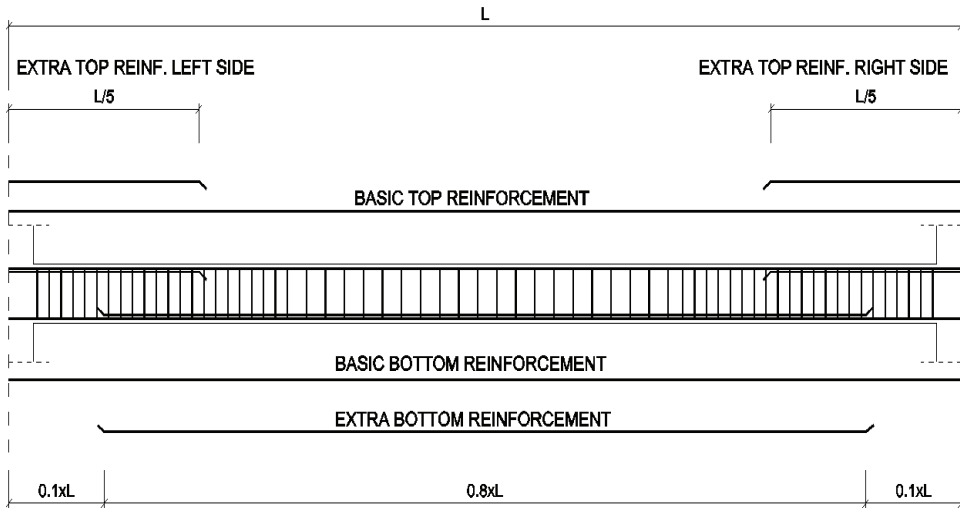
Typical longitudinal reinforcement bars of the beams of RC building frames.
